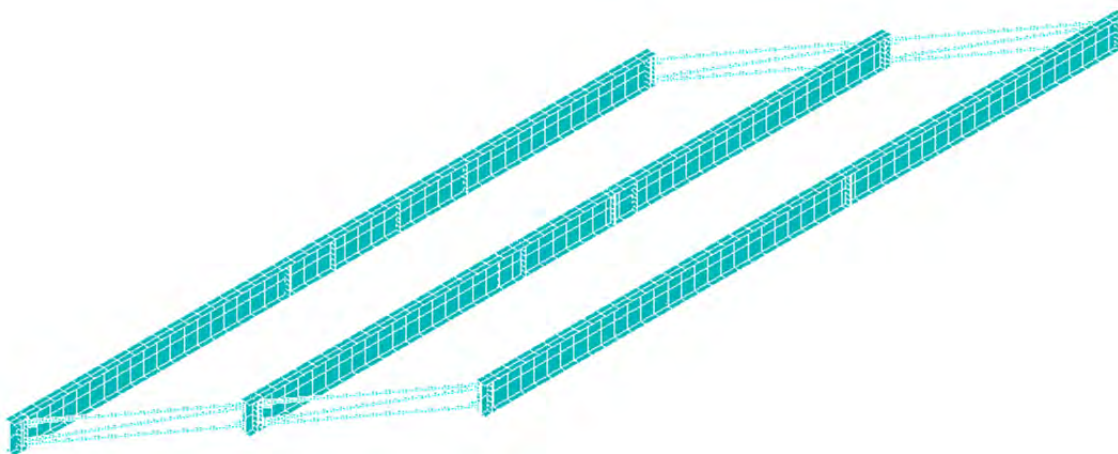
Three girder finite element model with bent plate end cross-frames
